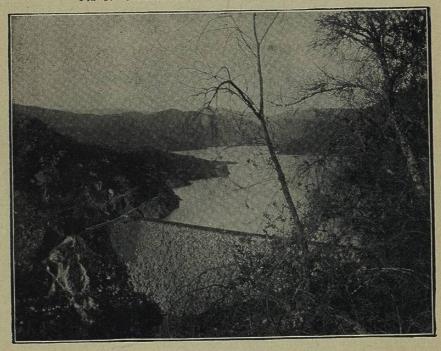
Escondido (Cal.) Rock-fill Dam. Wooden Lining.
